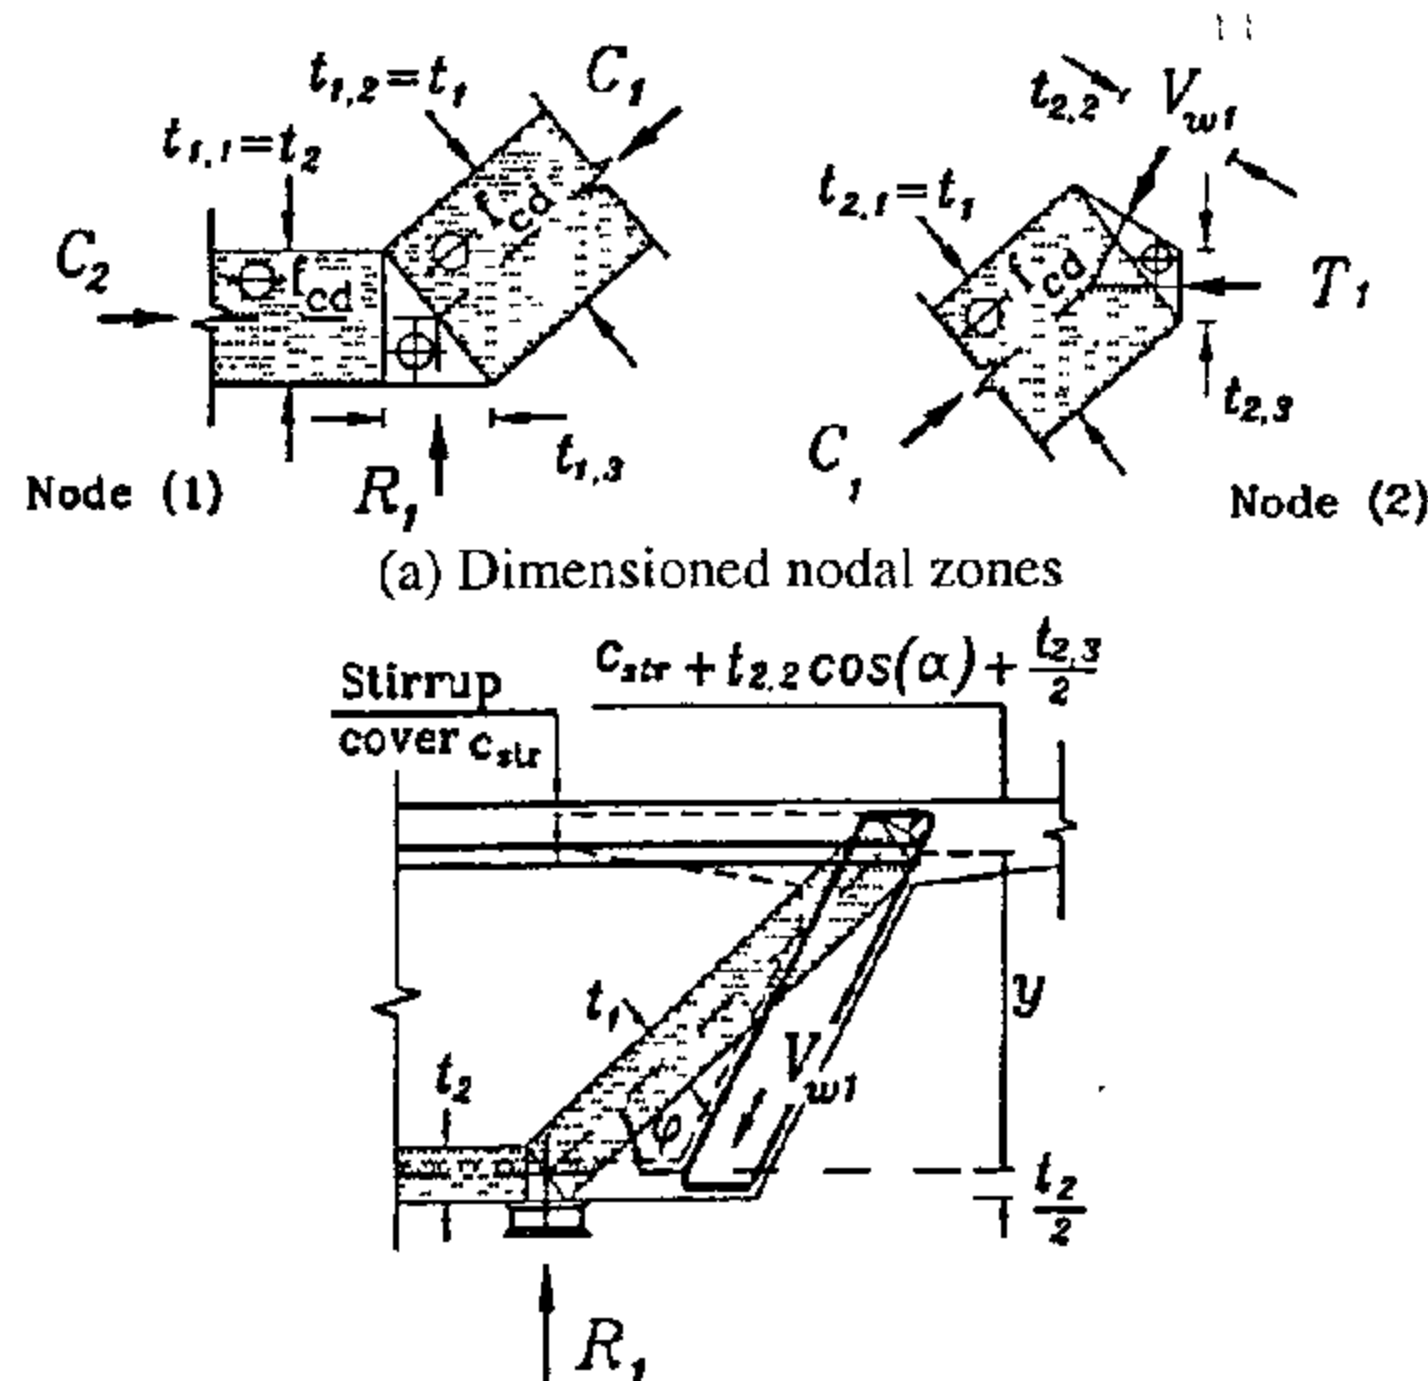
Strut and tie model for a box-girder diaphragm under maximum concentric loading
